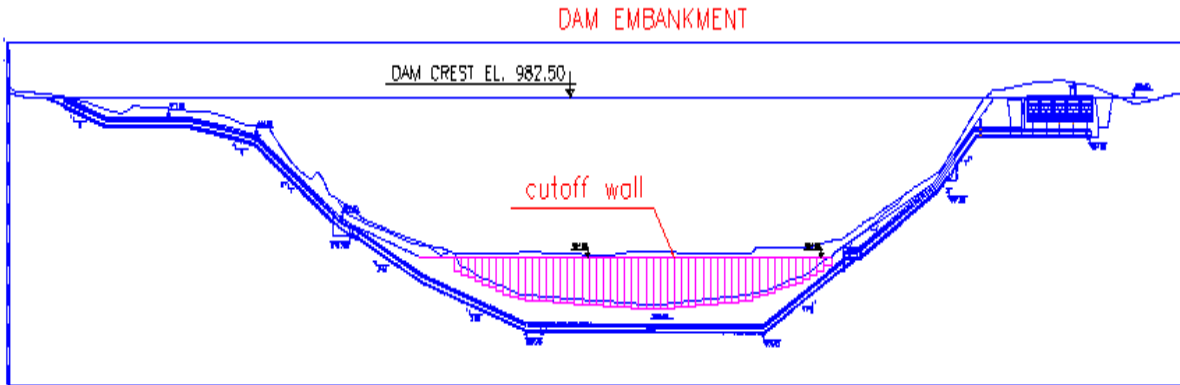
Cross-Section of the Dam Body and Cutoff Wall
